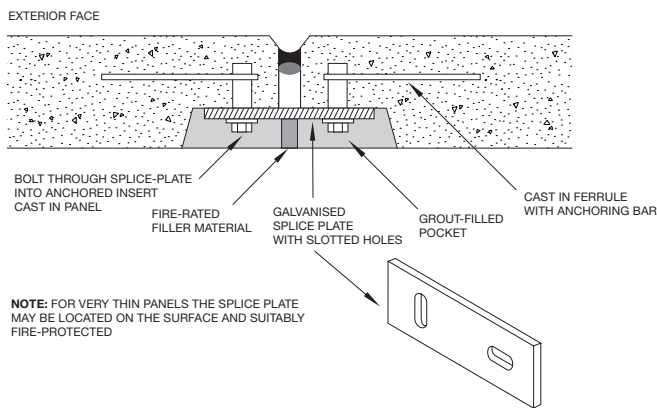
Plan View – Panel to Panel Top Restraint Connection, Without Lateral Continuity. (Bolted splice plate to cast-in ferrules). From CIA, Recommended Practice – Precast Concrete Facade Connections.
